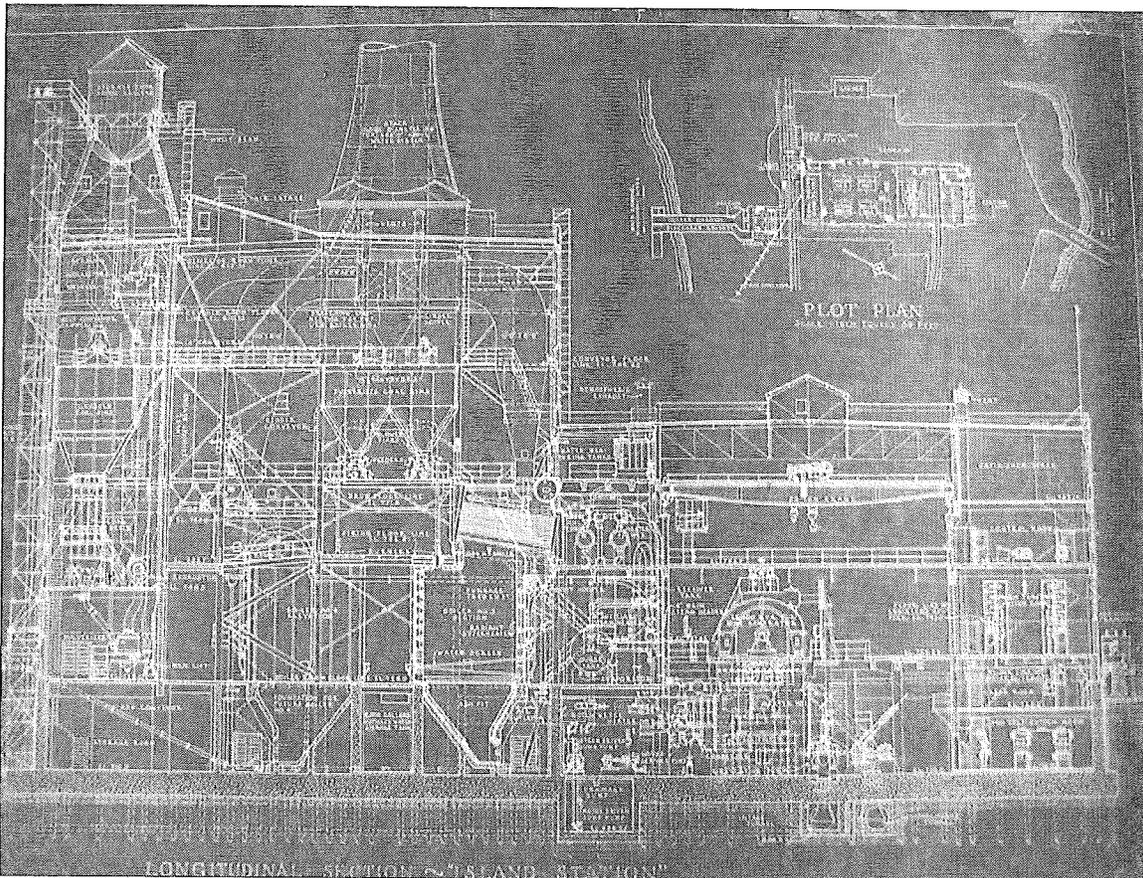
Toltz, King & Day, Island Station Power Plant, Longitudinal Section, 1923. NWAA.
